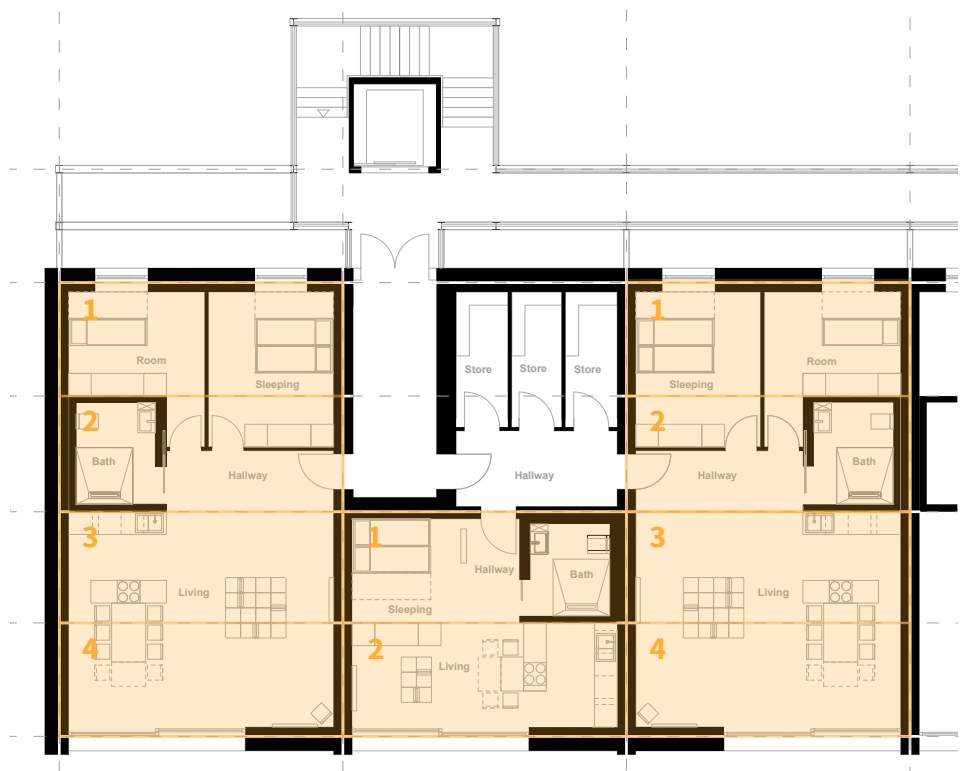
Floor Plan Level 1 of the addition of storeys showing the module system
